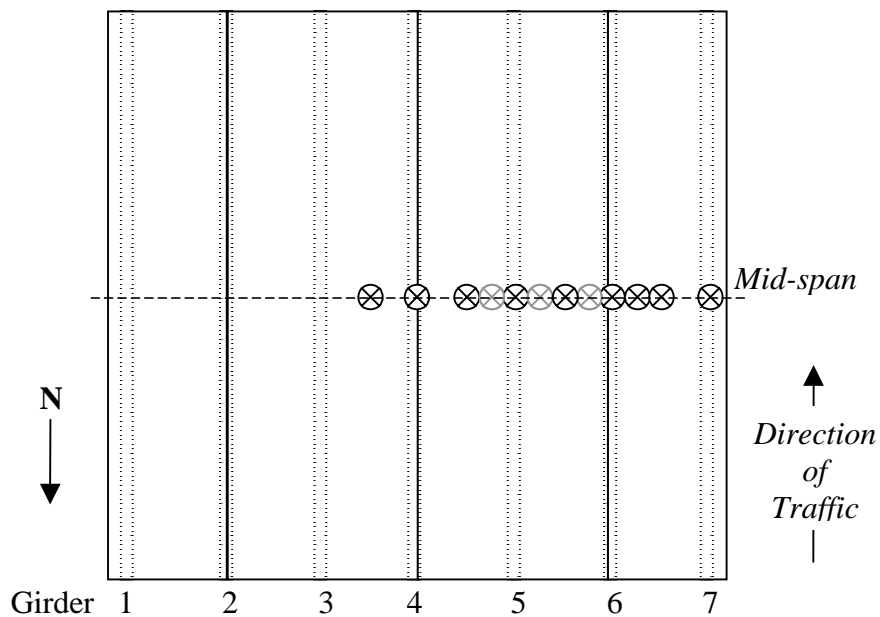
Layout of the DCVT Transducers – Jay Street
